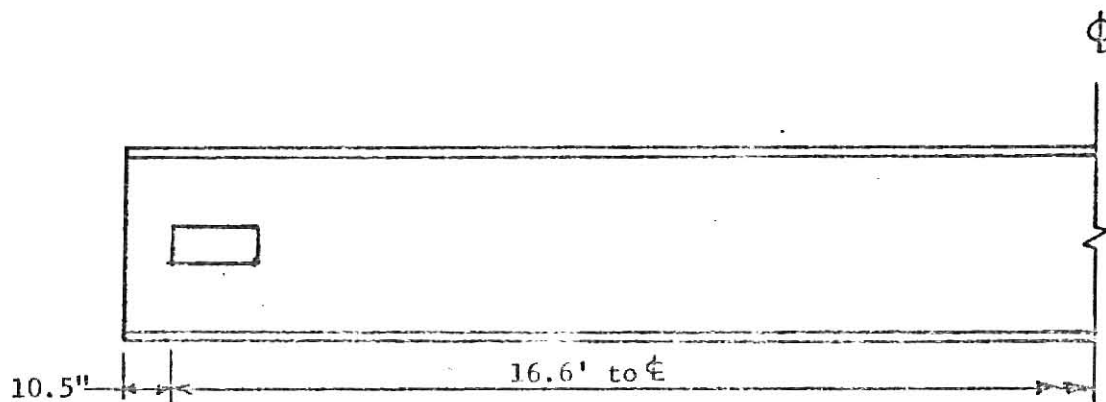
Permissible Opening Locations for Floor Beams with  $A_r = 2.81 \text{ in}^2$
